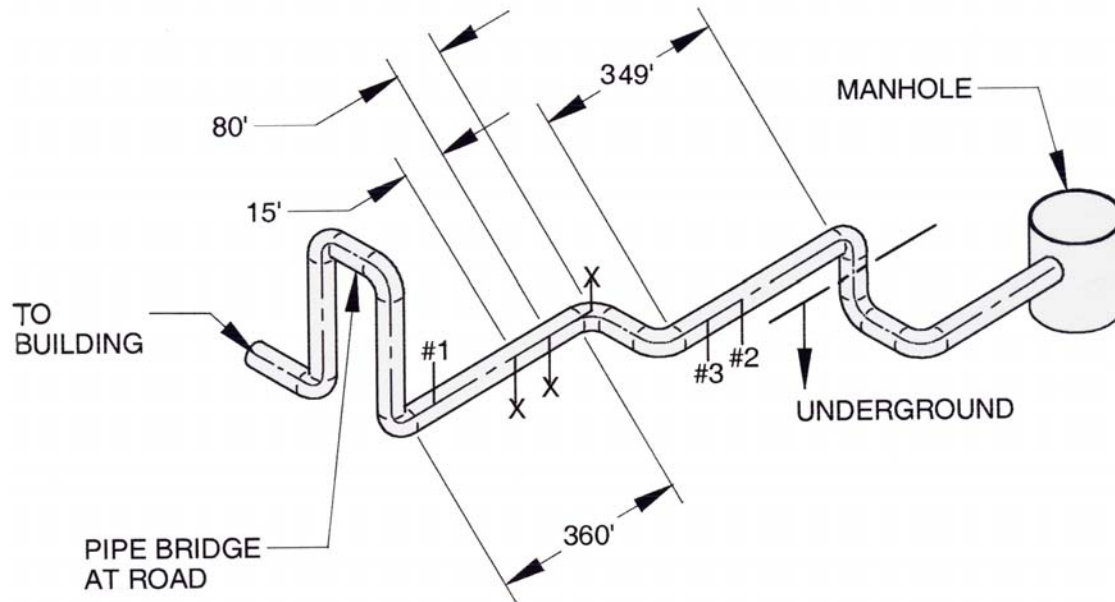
Sketch illustrating the non-insulated, above-ground portion of the overhead discharge piping from the evaporator. A simple gravity drain connects to a pipe bridge having a 30-foot vertical rise and drop at a road crossing (on the left) and a 12-foot vertical drop further down stream at the manhole end (on the right). A pump at the evaporator facility forces the liquids across the pipe bridge. "X" identifies locations where breaks occurred in the core pipe of the jacketed line.
